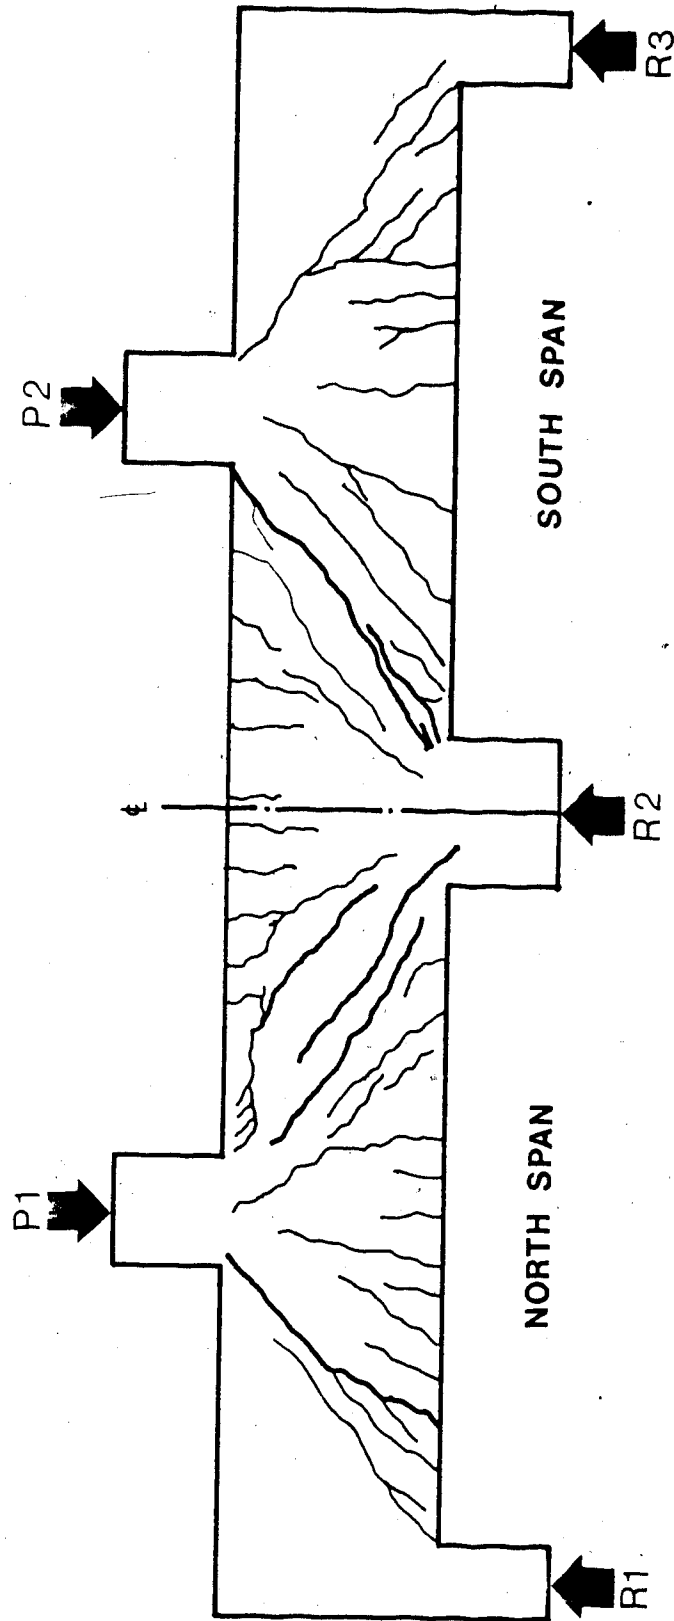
Failure Cracking Pattern of Beam No. 2
